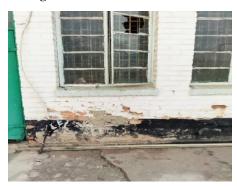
Poor painting of Sanlam Building and Leaking Roof – Ex Legal Building in Kitwe
